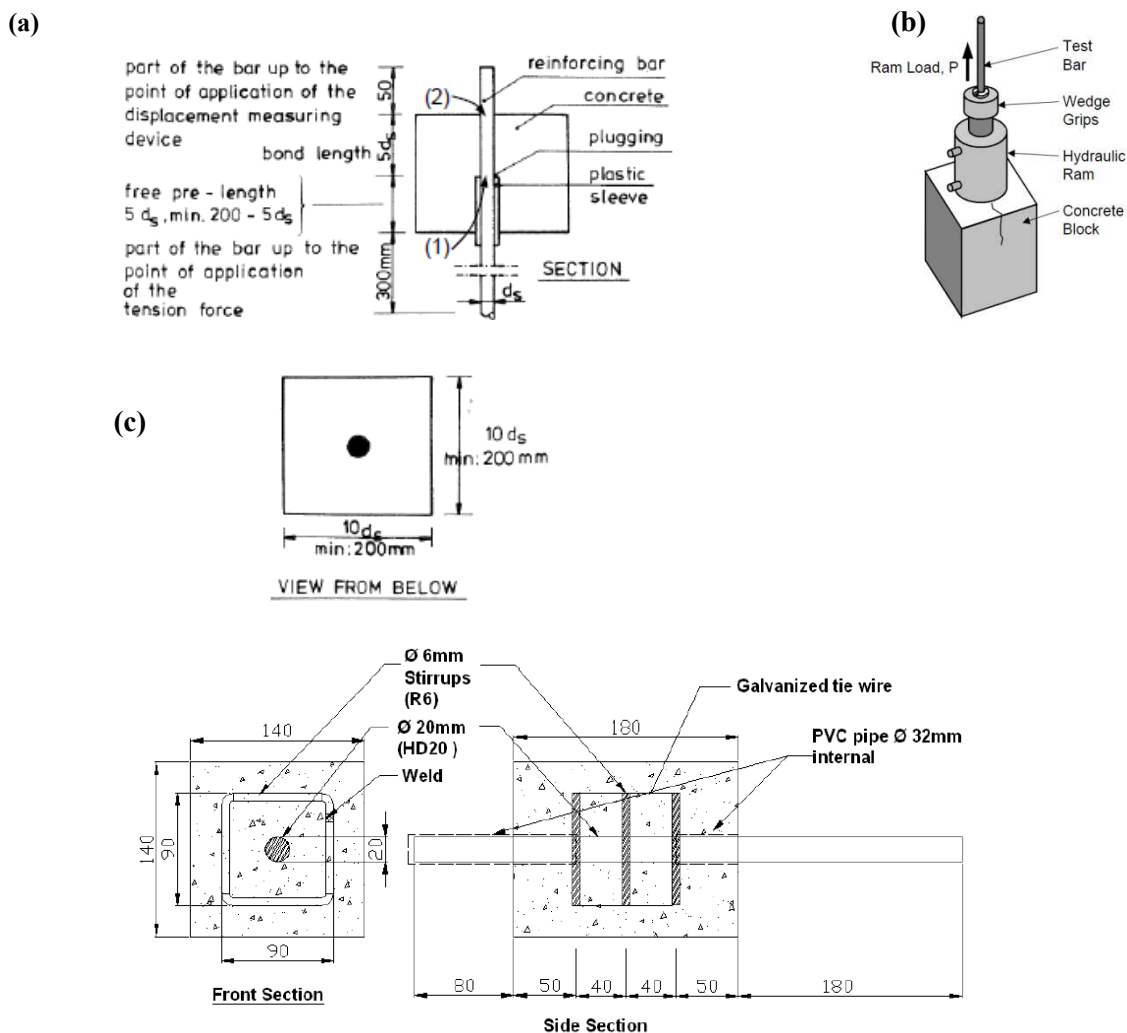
(a) Schematic illustration of the specimen details, (RILEM/CEB-FIP, 1982); (b) simplified loading arrangement (right, Thompspon, 2002) for the recommended set-up for monotonic bond pull-out tests; (c) drawings of pull-out specimens by Kivell (2011).
